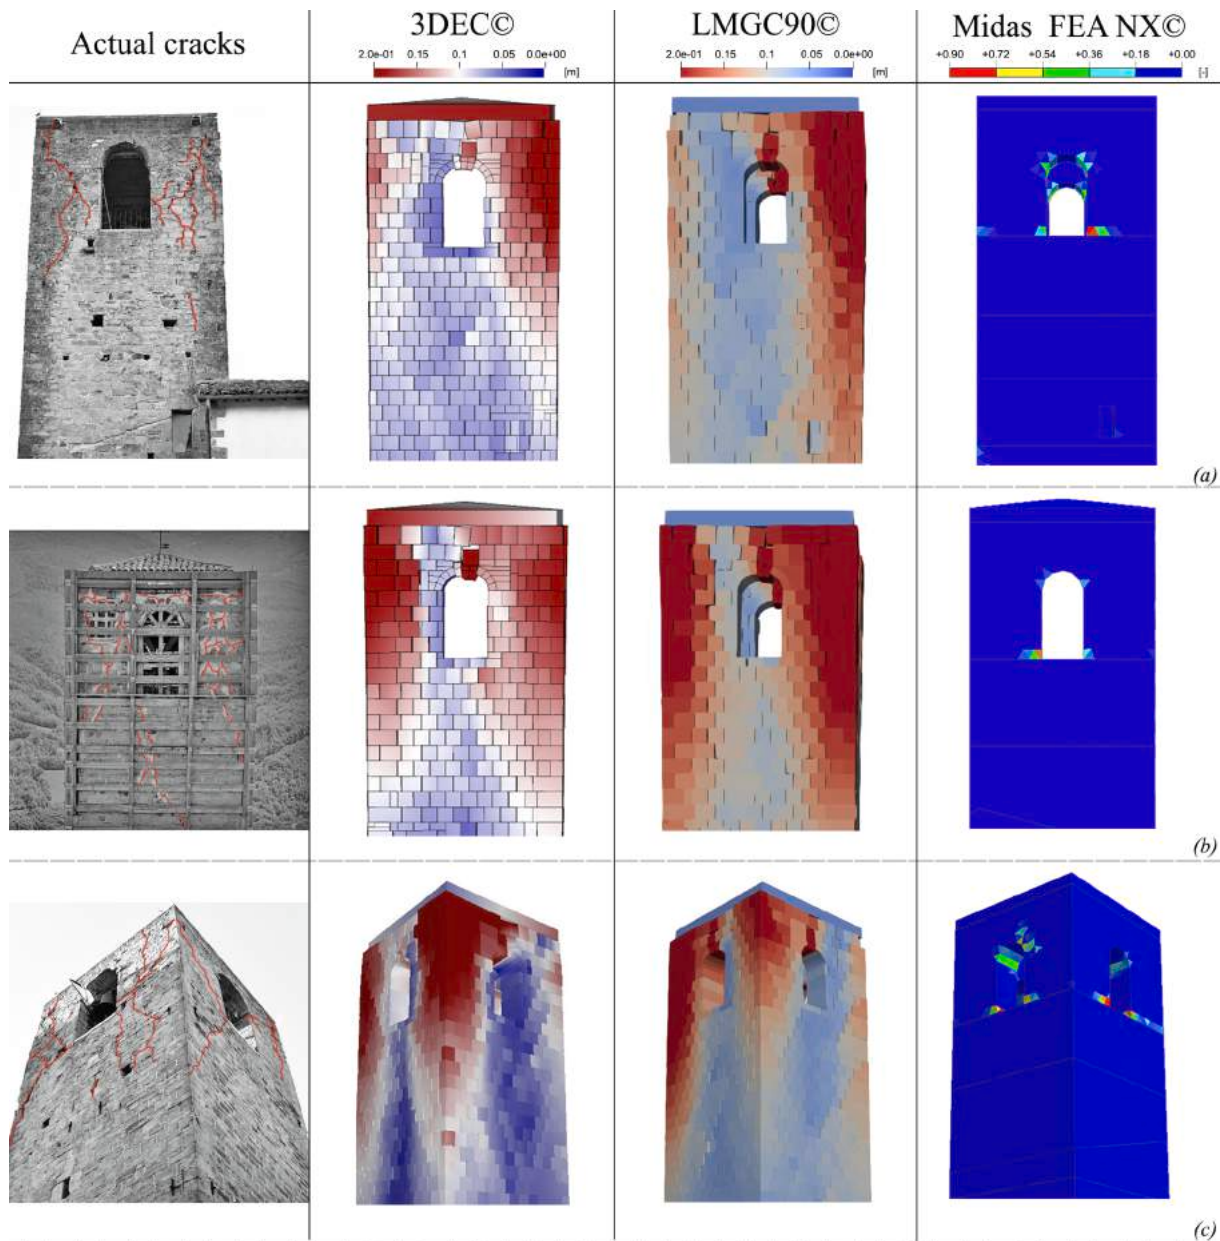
Comparison of the actual cracks and the numerical damage, obtained with each software, for the tower alone. (a) Bell-tower North façade; (b) Bell-tower West façade; (c) Bell-tower South-East corner.
